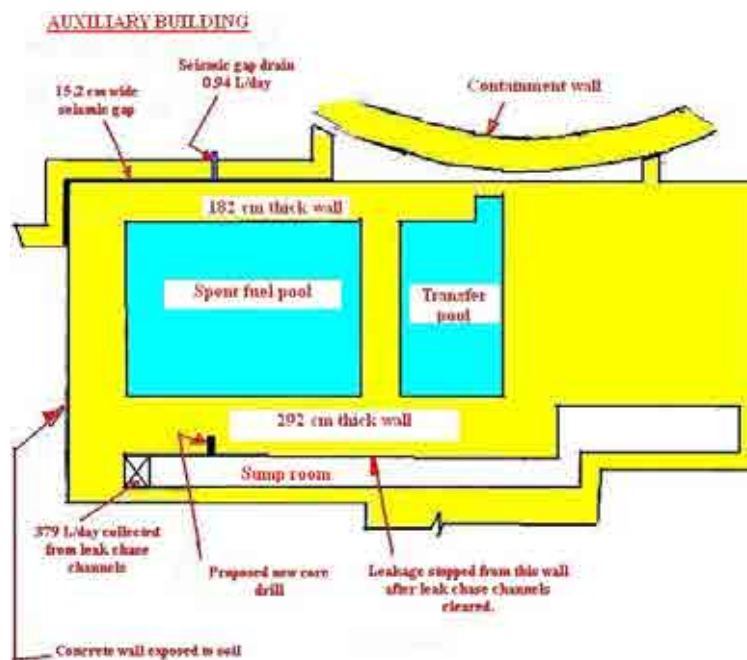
A fuel handling building showing the relative location of the SFP, transfer pool and containment building (adapted from Ref. [17]).
